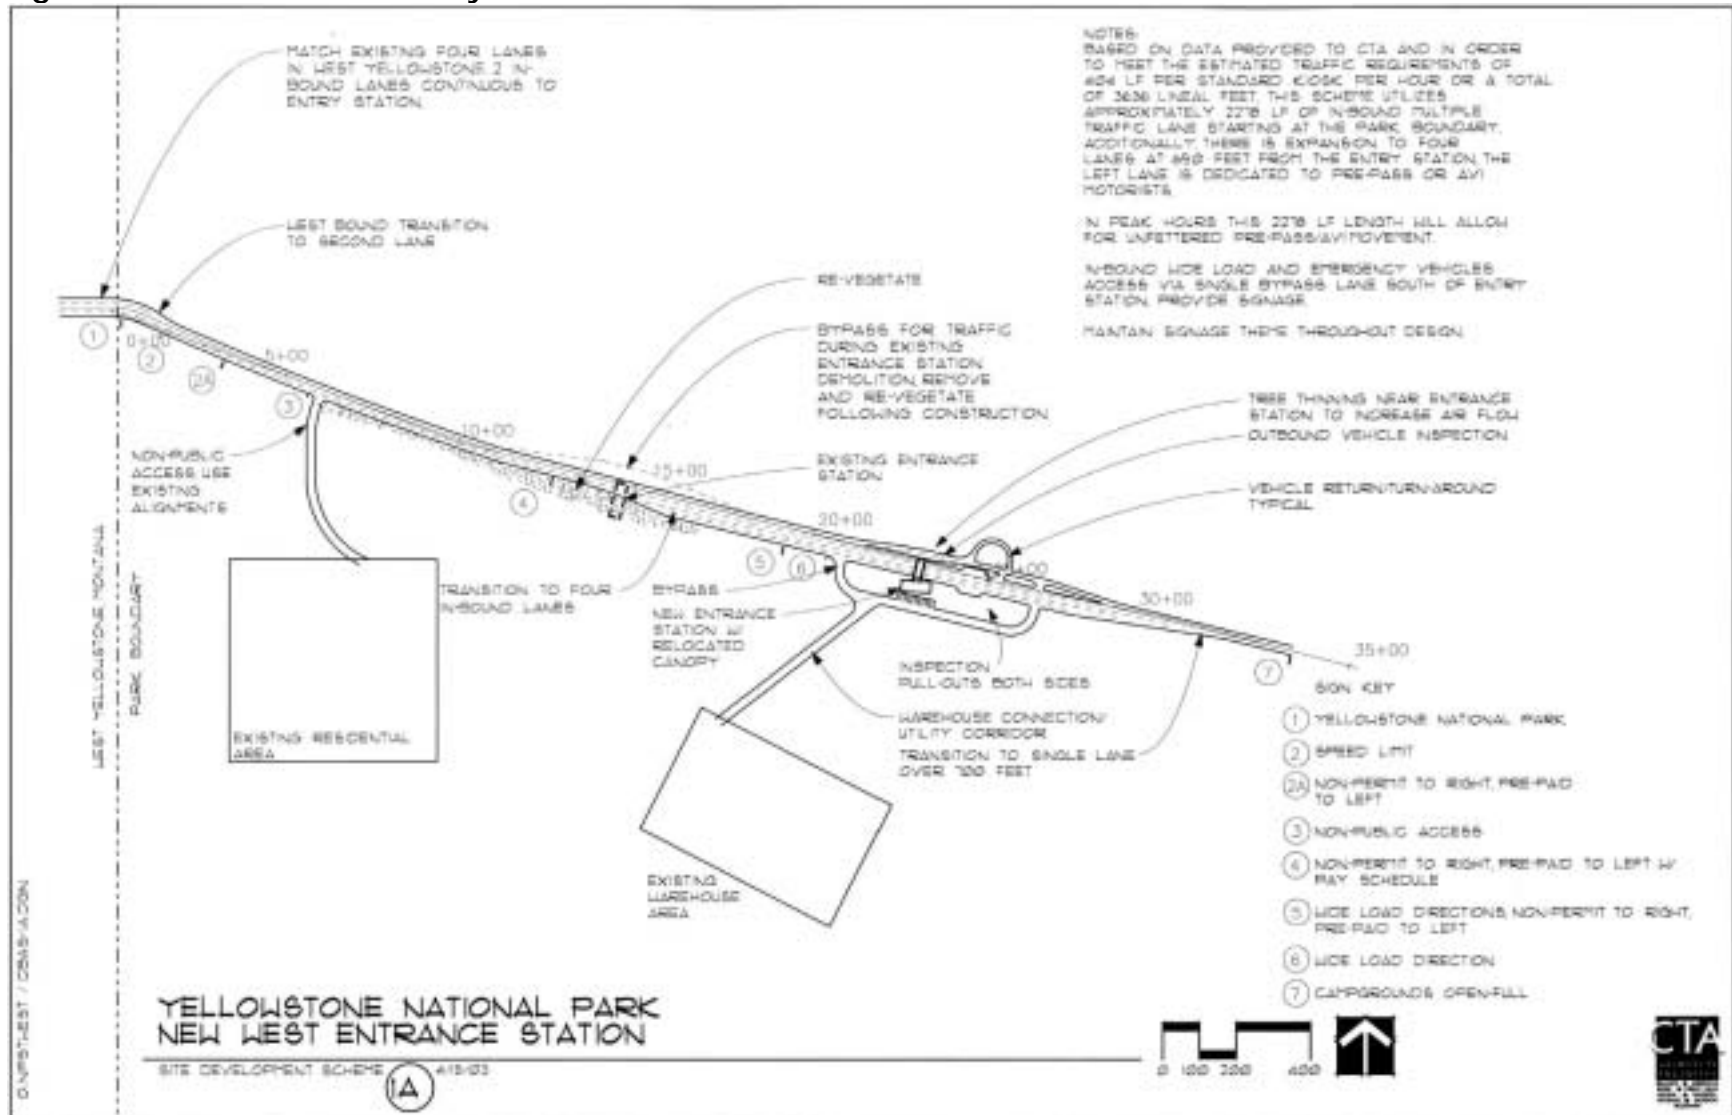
Alternative 2 Site Layout, Entrance Station Detail
